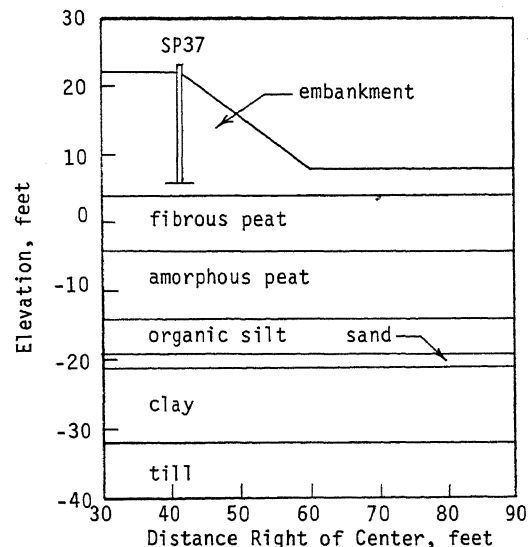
Idealized Cross Section Through the Site in the Vicinity of Station 194+50
